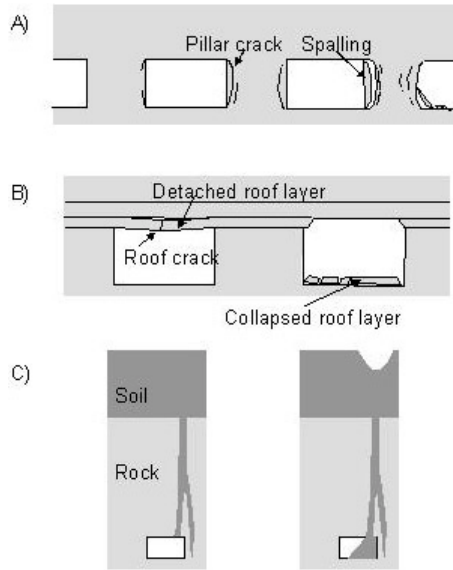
Three main types of local instability: a) pillar cracking and spalling b) failure and collapse of immediate roof layers c) earth inflow from organ pipes.
